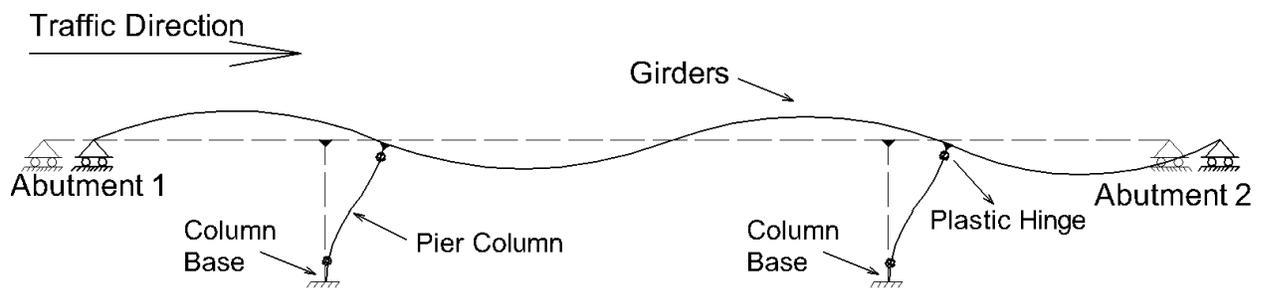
Deflected shape of a 3-span bridge under longitudinal (along traffic) direction.
